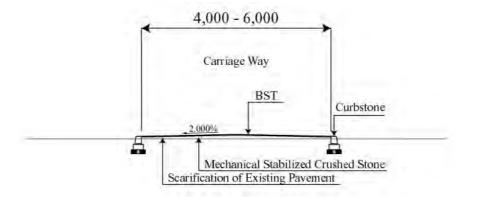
Standard Cross-Section: Bairiki Wharf Road in Bairiki
